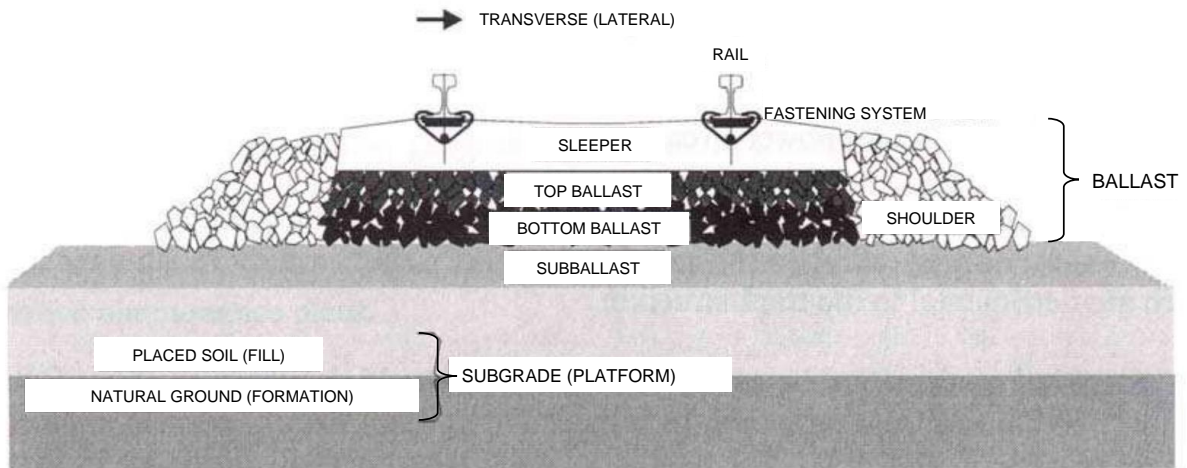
Transversal view of the structural component of a typical ballasted track (Selig & Waters, 1994).
